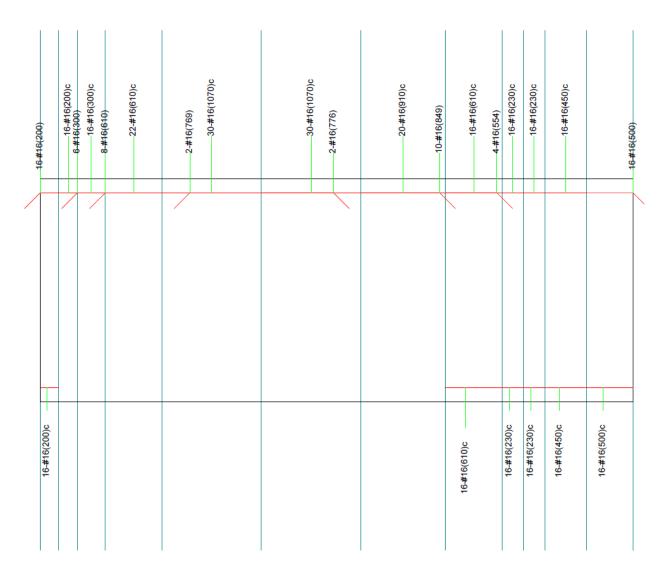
As Designed Flexural Reinforcement - Design Mode (spBeam)
